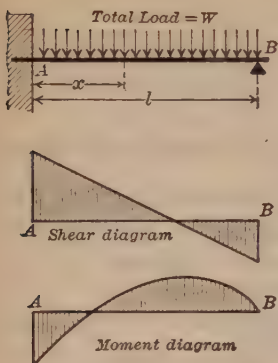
Beam Fixed at One End, Supported at the Other, Uniform Load.
